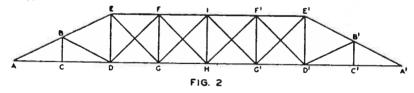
represents a 90-ft. truss; but the following instructions are also applicable to 75 and 65 feet trusses.
